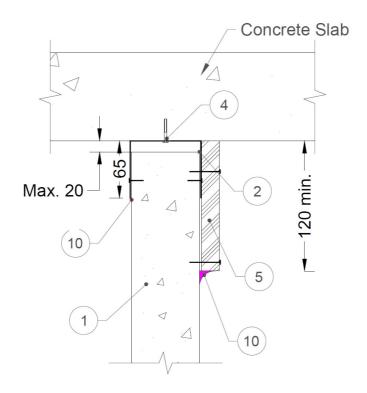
Head Detail E – One Layer of PROMATECT® 100 Board on One Side (Section View)
